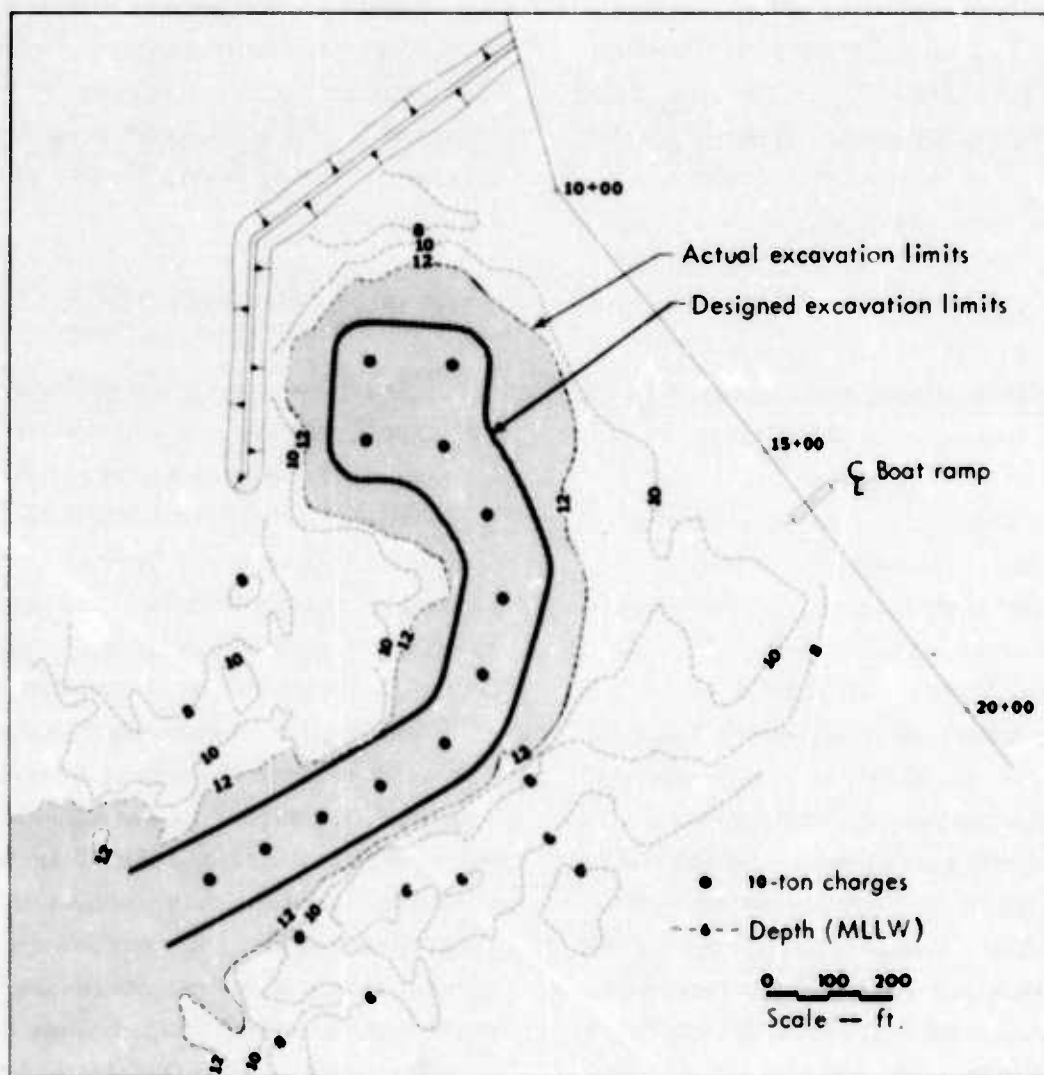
Planned area of excavation and final 12-ft depth contours after remedial detonations, Project Tugboat.¹⁰
